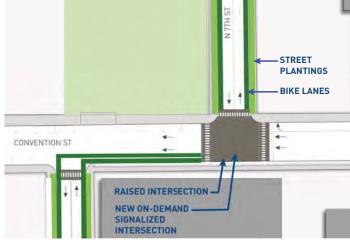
The design concept for the intersection of North 7th Street and Convention Street shows how the bikeway would run on the south side of Convention Street where there is currently on-street parking.
